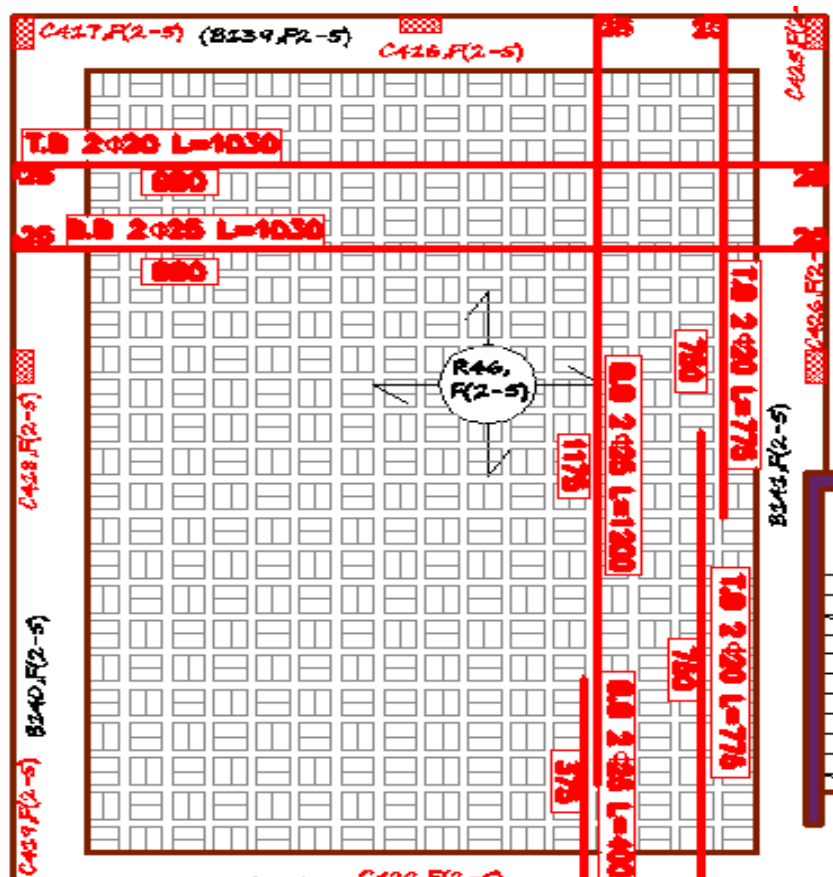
Flexural Design of Two Way Rib Slab (R46).
